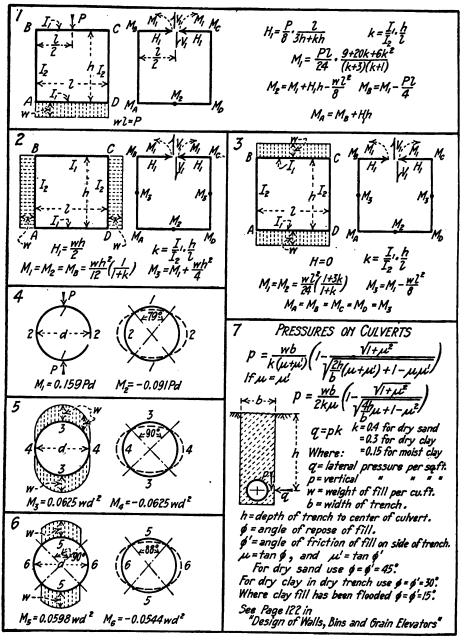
Stresses in Culverts and Pressures on Culverts.
